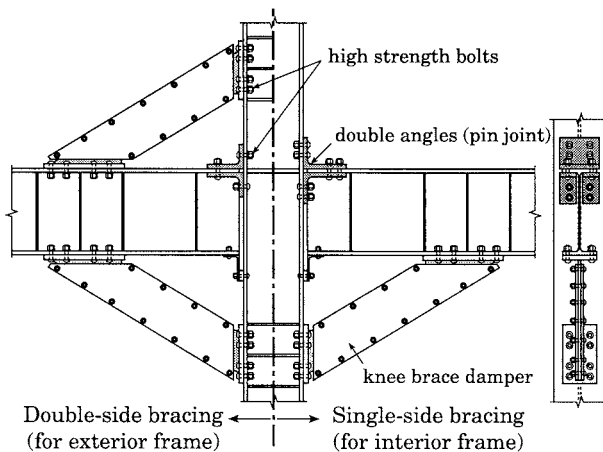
Details of beam-to-column connection of weld-free structural system
